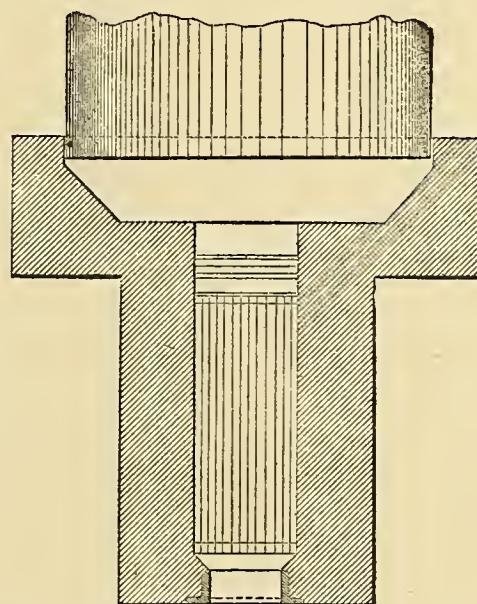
HORIZONTAL SECTION OF FIRE-PLACE.
